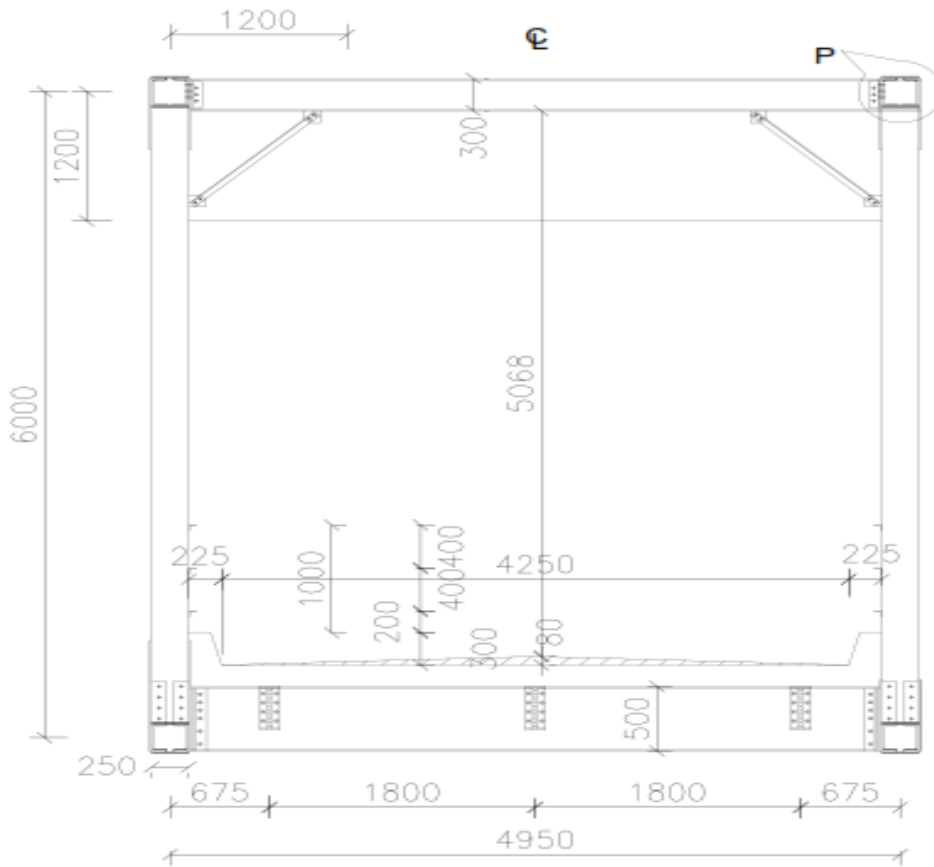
Typical Cross-section of a Single-lane Truss Bridge without Footpaths (30 m span)
